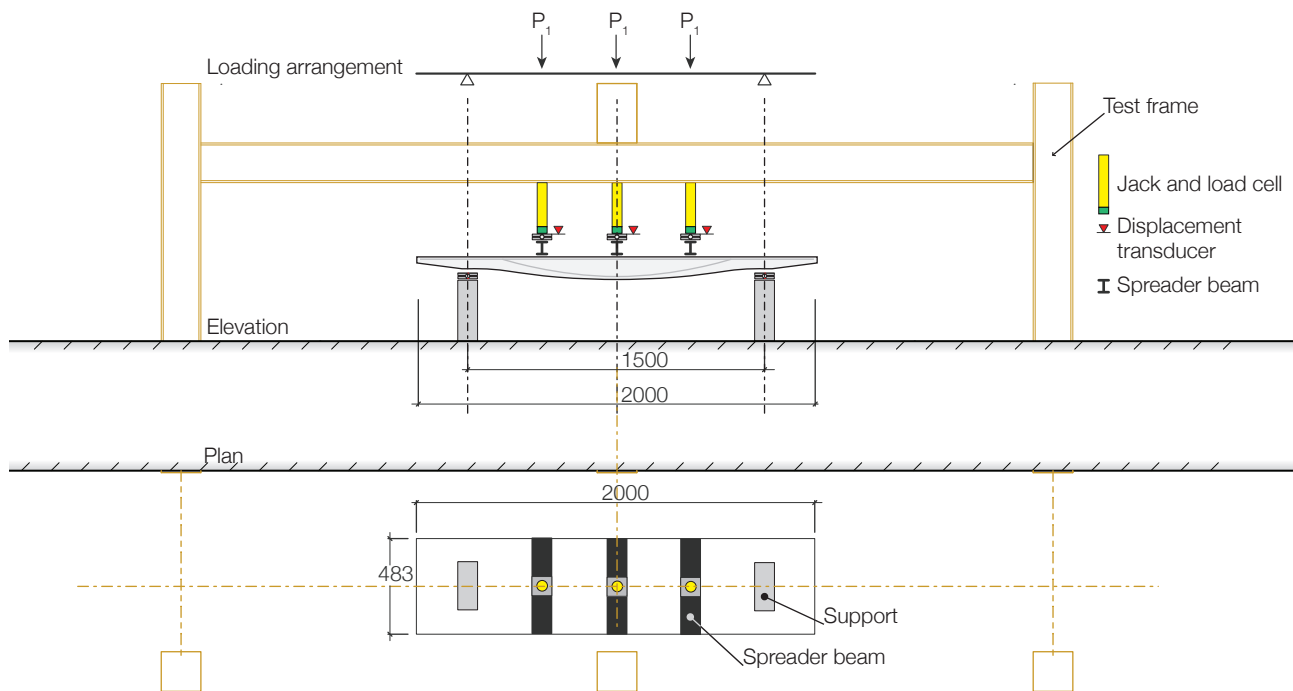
Testing arrangement, Beams 7\_4 and 7\_5.
